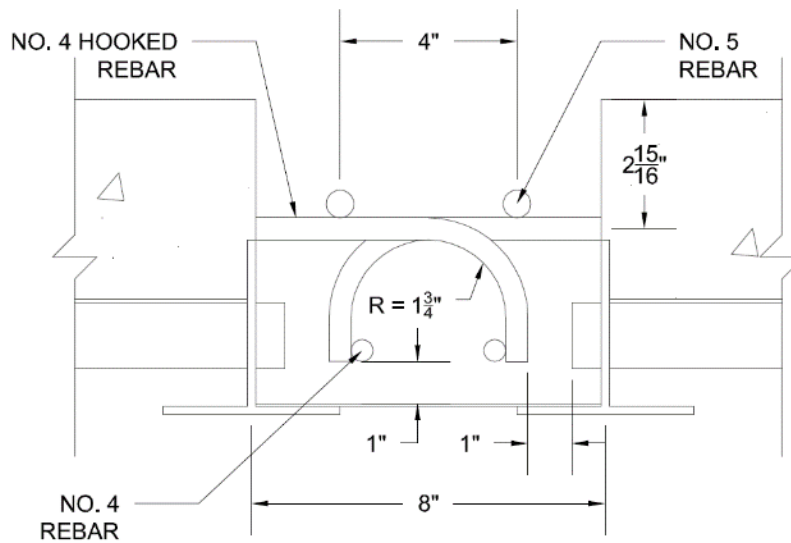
Staggered Hook Reinforced Joint Dimensions
